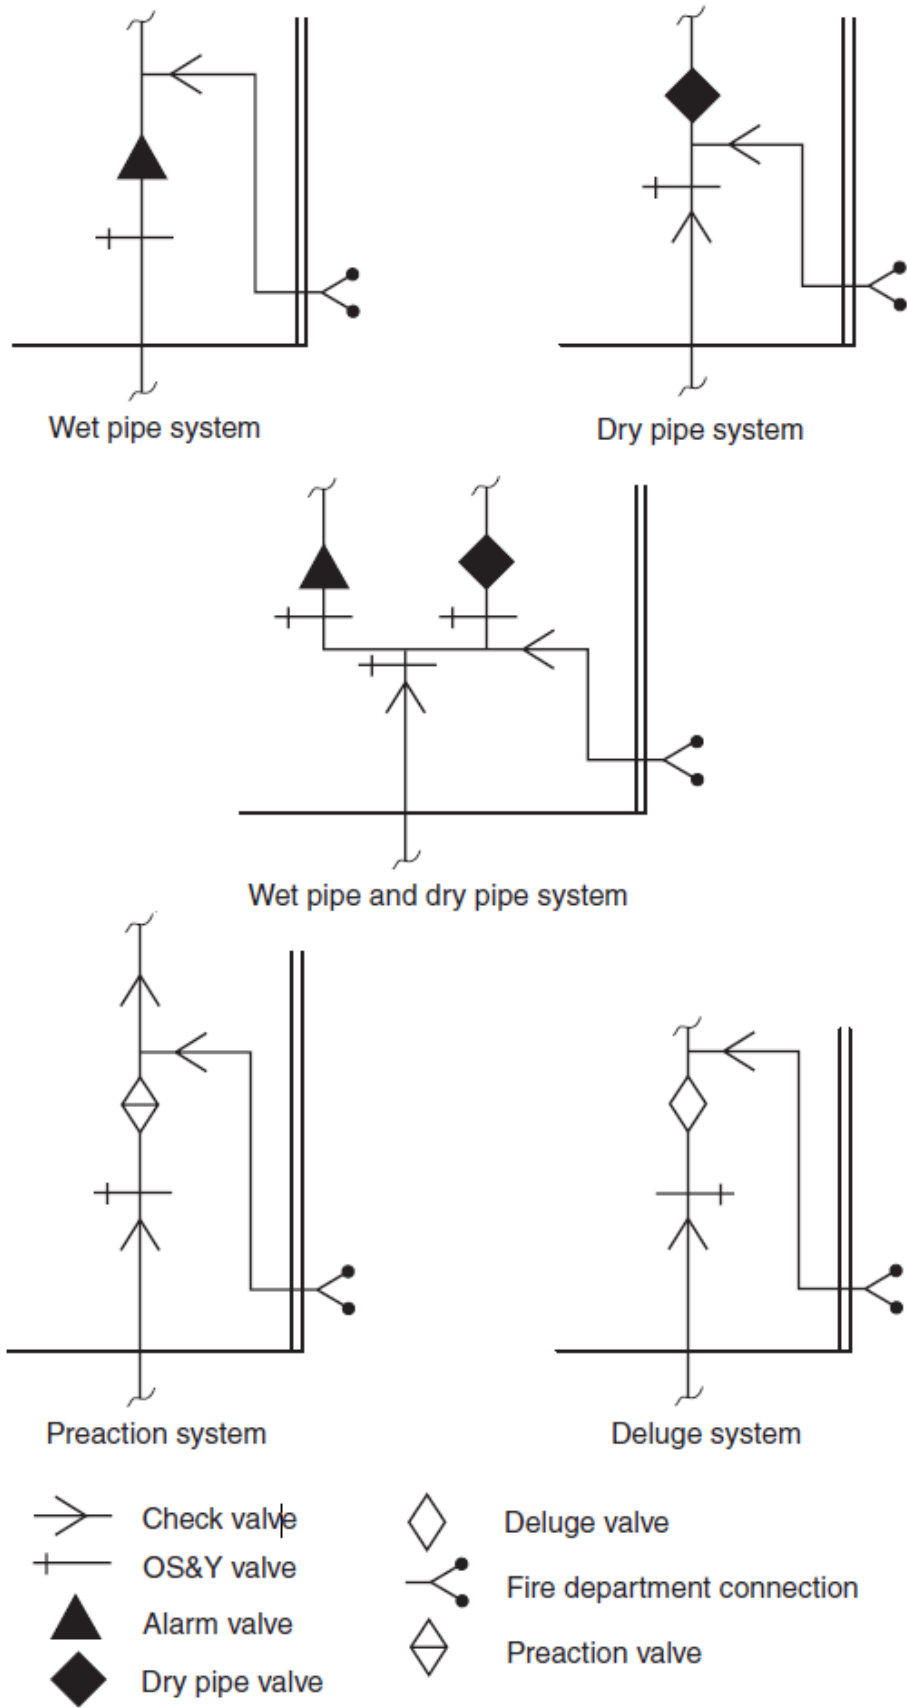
Examples of Acceptable Valve Arrangements.
